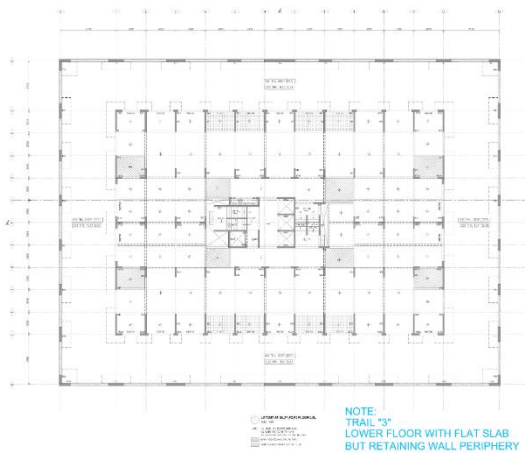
Lower floor with flat slab but retaining wall periphery (Trail:03)
